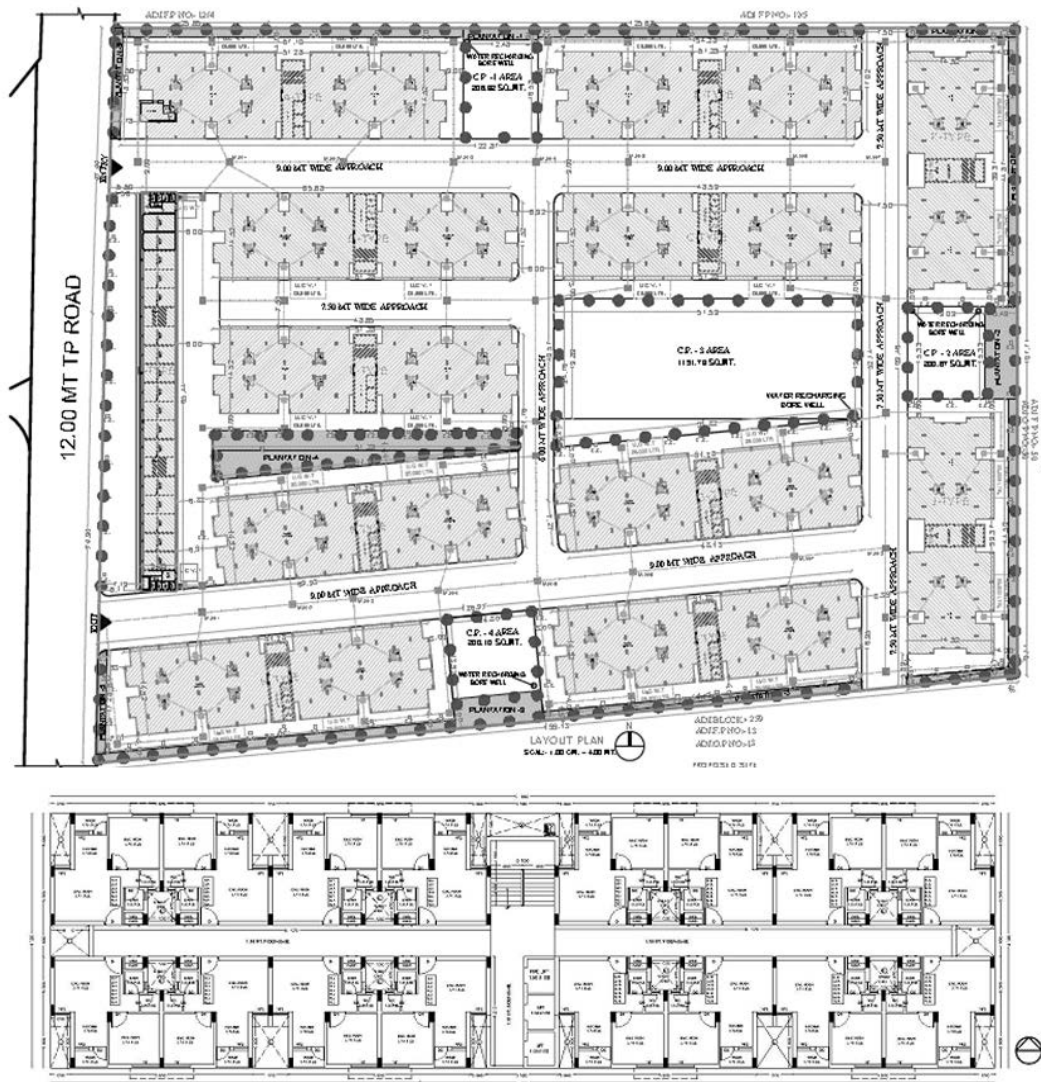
Site plan and typical unit plan of SMARTGHAR-III project, Rajkot
